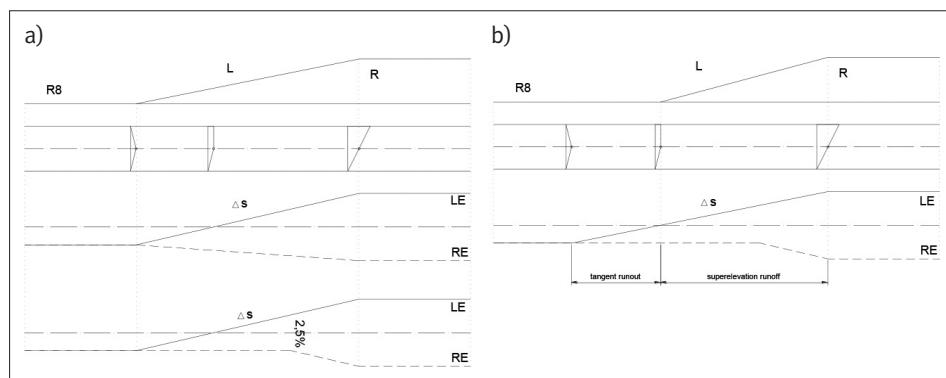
Superelevation design from crowned cross section on tangent to one-sided cross section on curve
